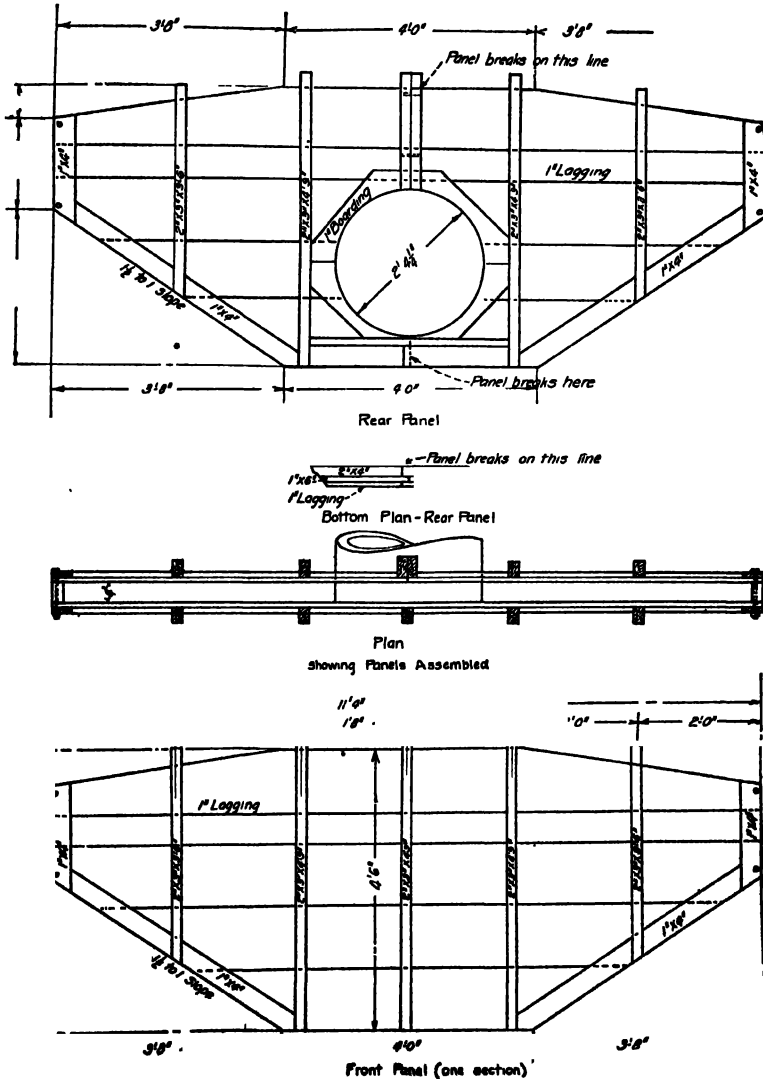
Panel forms for headwalls of pipe bridge—U. S. Reclamation Service.
